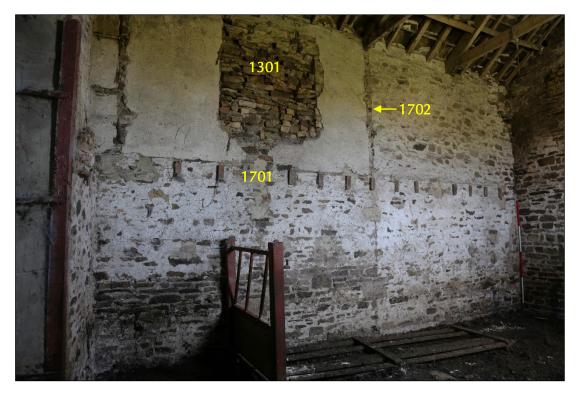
internal elevation 1700 showing blocked opening 1301 and the sawn-off floor joists (1701).
